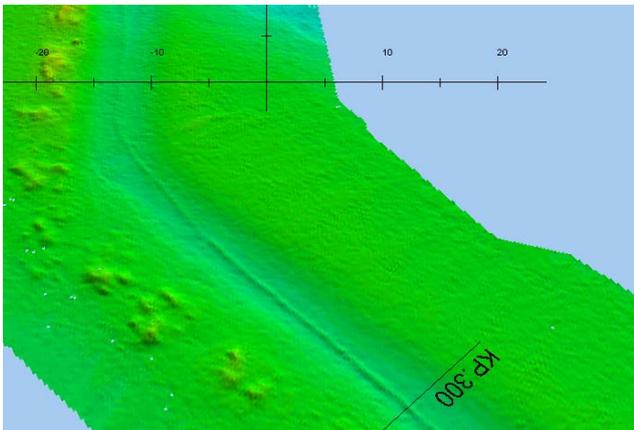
Multi-beam survey showing a cable in a trench. It can be seen that the cable is in the trench which makes it possible to finish the work with jetting and filling of the trench with excavated material without the risk of damaging the cable.
